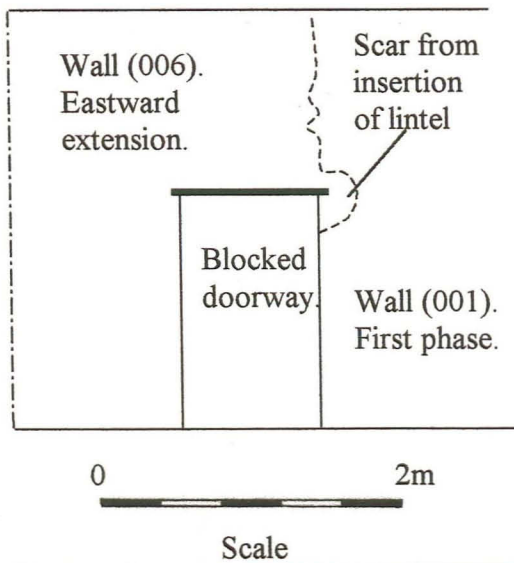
North facing elevation showing two phases of wall building and doorway between, later blocked. 1:50
